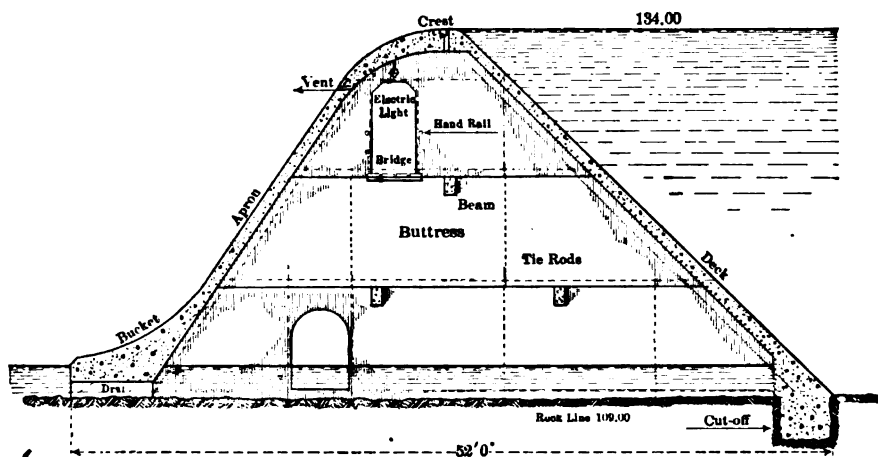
SECTION OF HOLLOW CONCRETE-STEEL DAM.
